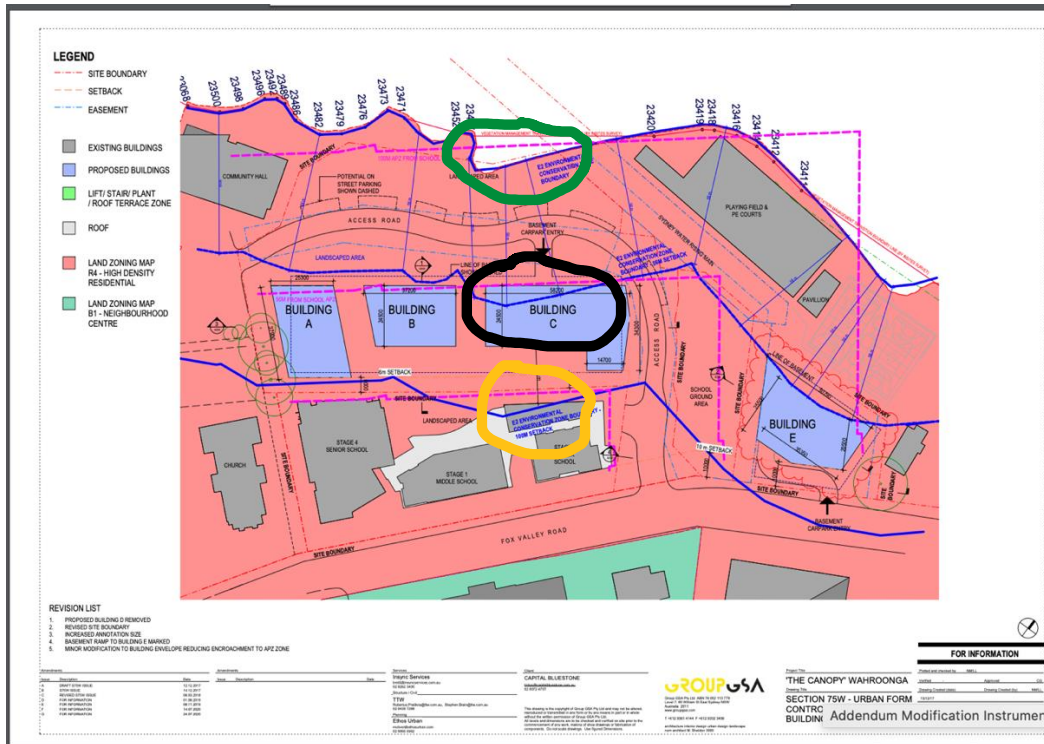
| Revised Scheme (source: Group GSA Architects plan submitted with revised request)
